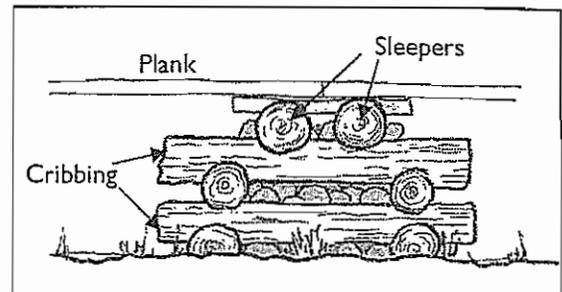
Bog Bridge with Sleepers, or Single Plank Boardwalk
